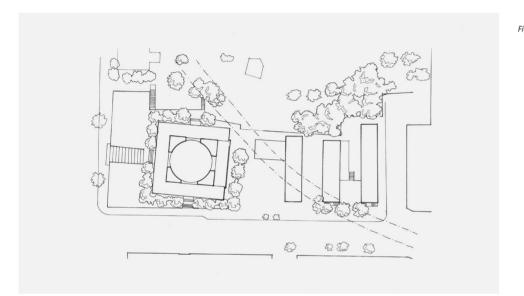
Site Plan, Existing, 1:1000 @ A3.
